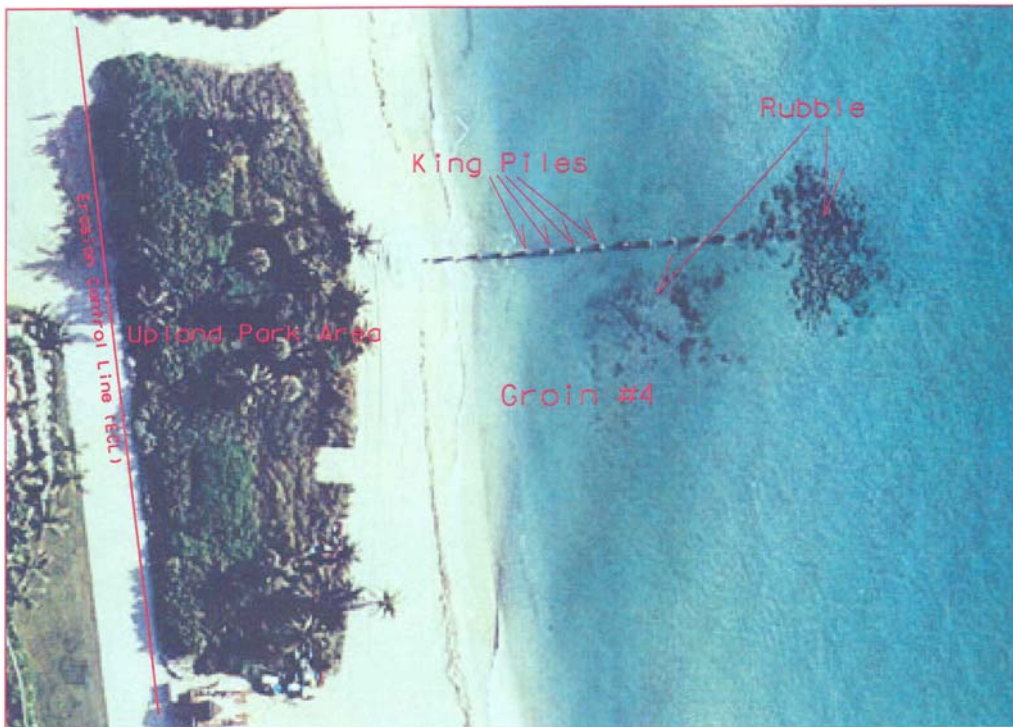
Typical king pile groin, aerial view, with beach in eroded condition.
